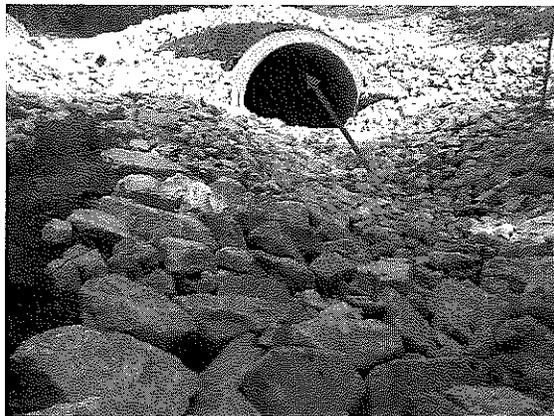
Sediment deposited in pipe at Sta. 1100+00
